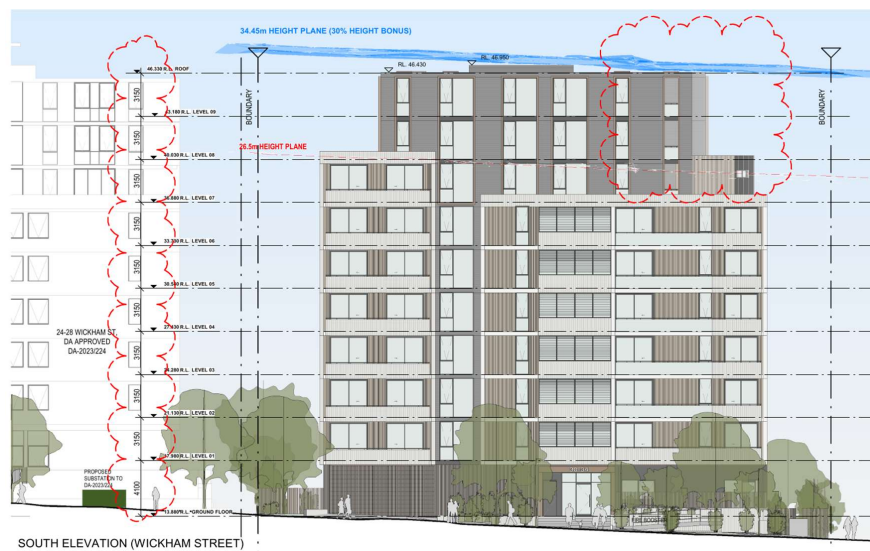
Front elevation of the proposed residential flat building along Wickham Street.
